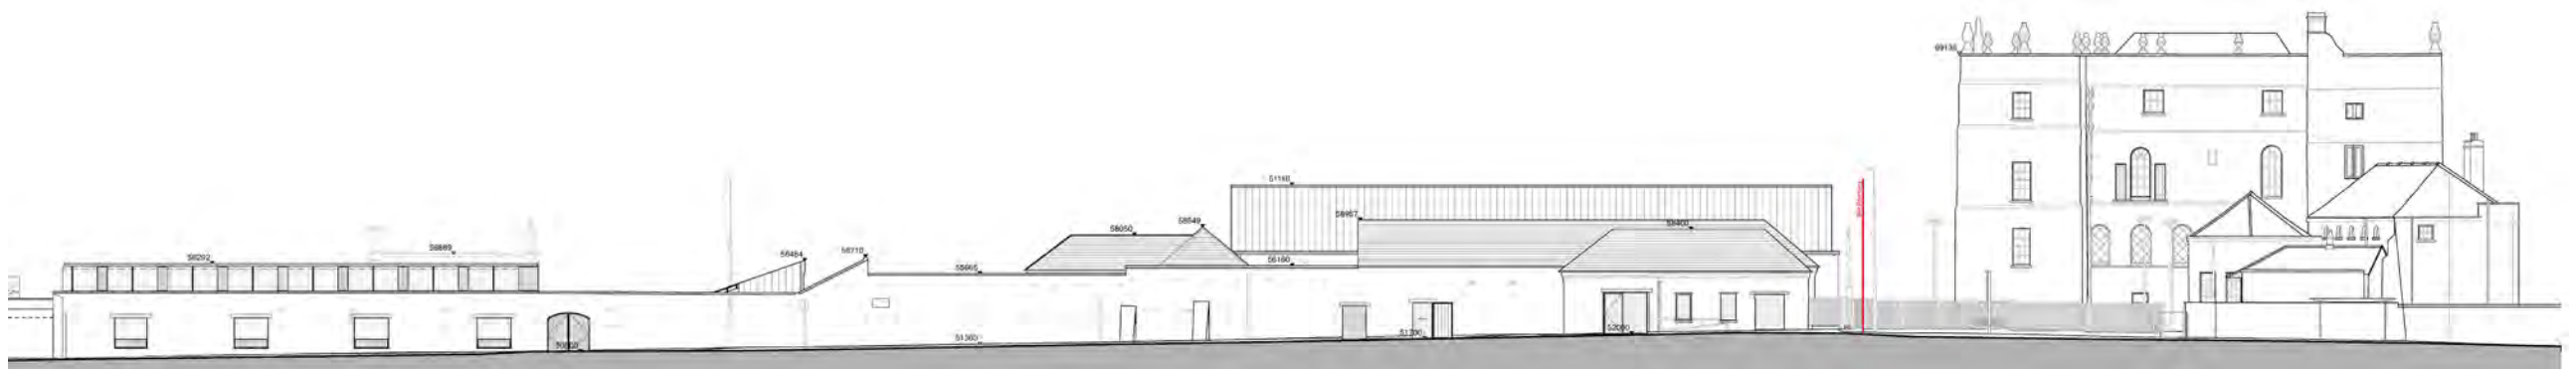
Proposed west elevation to existing carpark indicating scale of development in the context of the Castle
